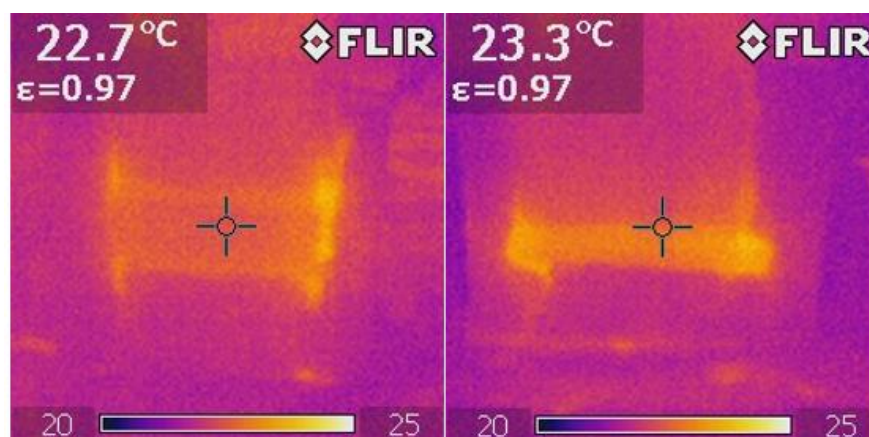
Thermal Camera Inspection on Flat Staple (left) and Round Staple (right) anchor specimens
